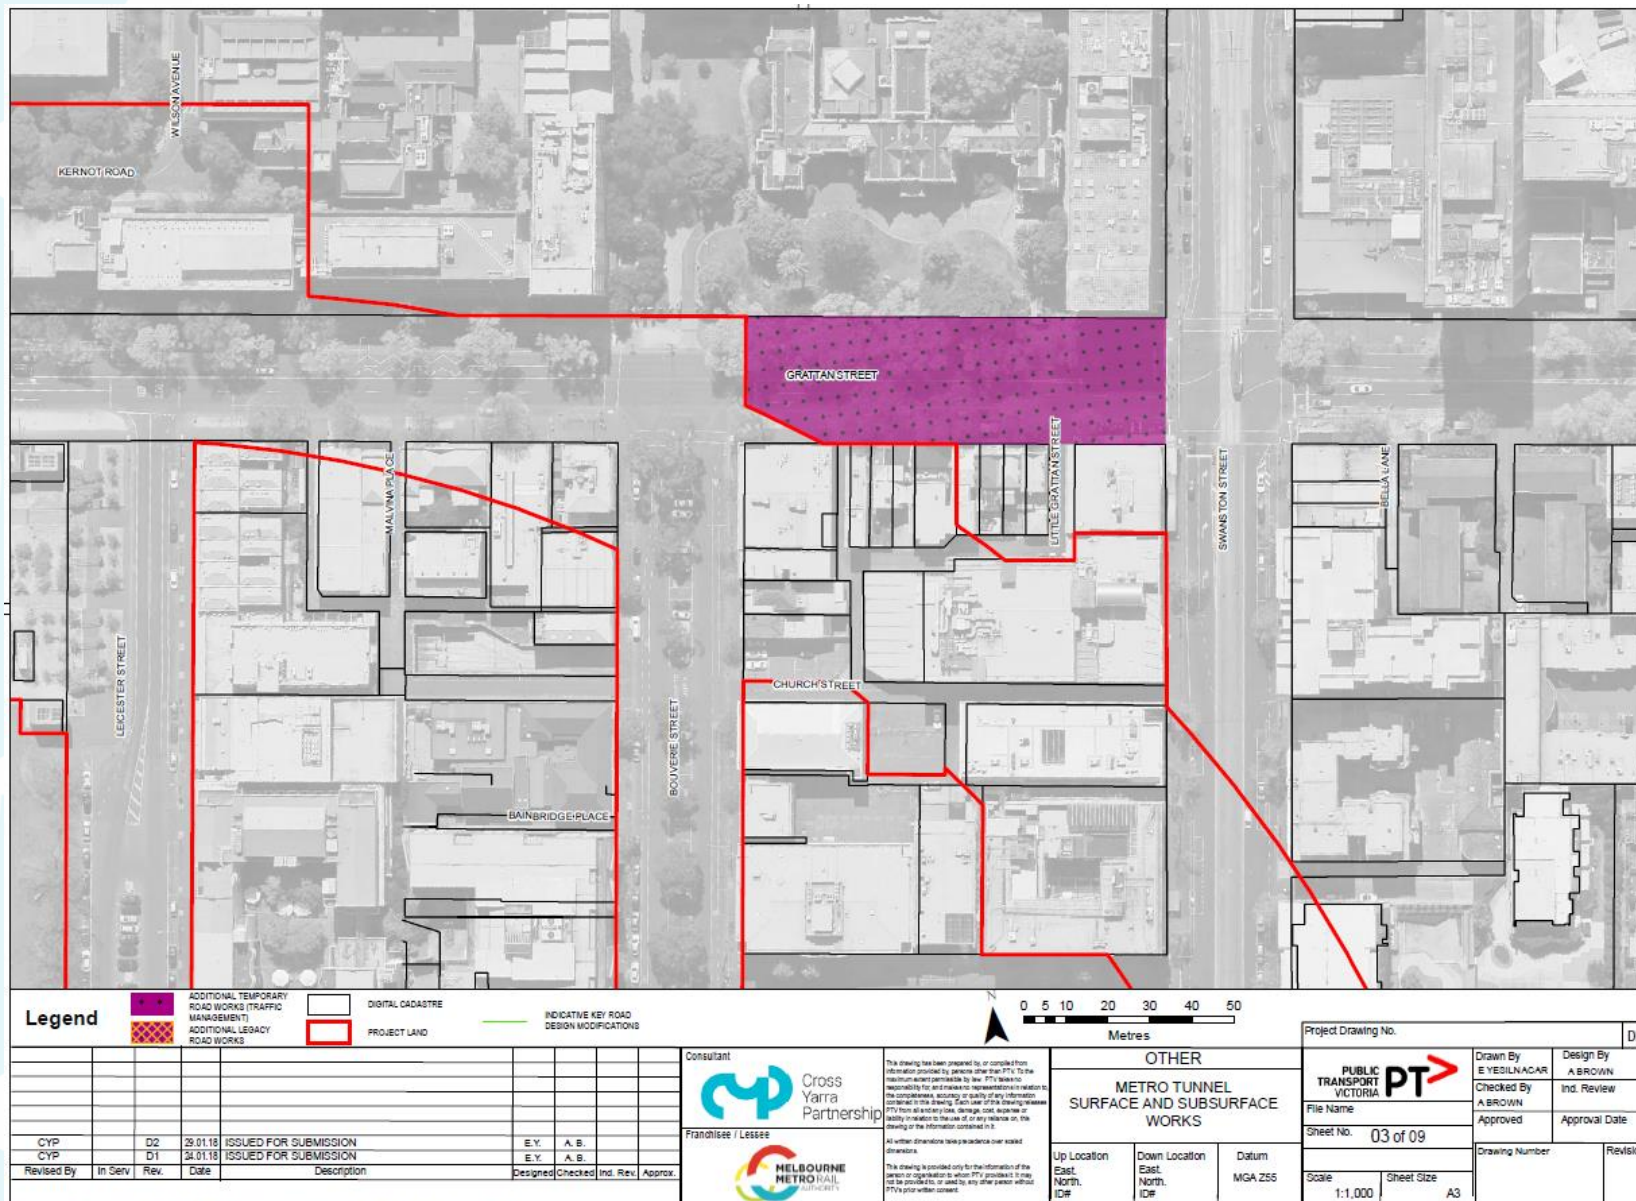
GRATTAN STREET ADDITIONAL ROAD SURFACE WORKS
